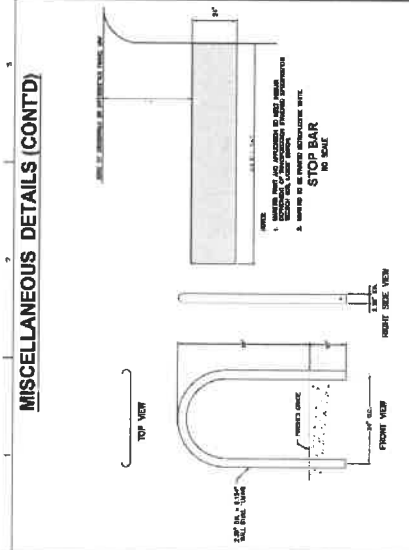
EXHIBIT D, CONT. PRELIMINARY DEVELOPMENT PLAN
